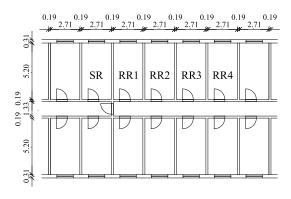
Field test construction: Ground floor plan of the timber-frame building (dimensions in metres).
